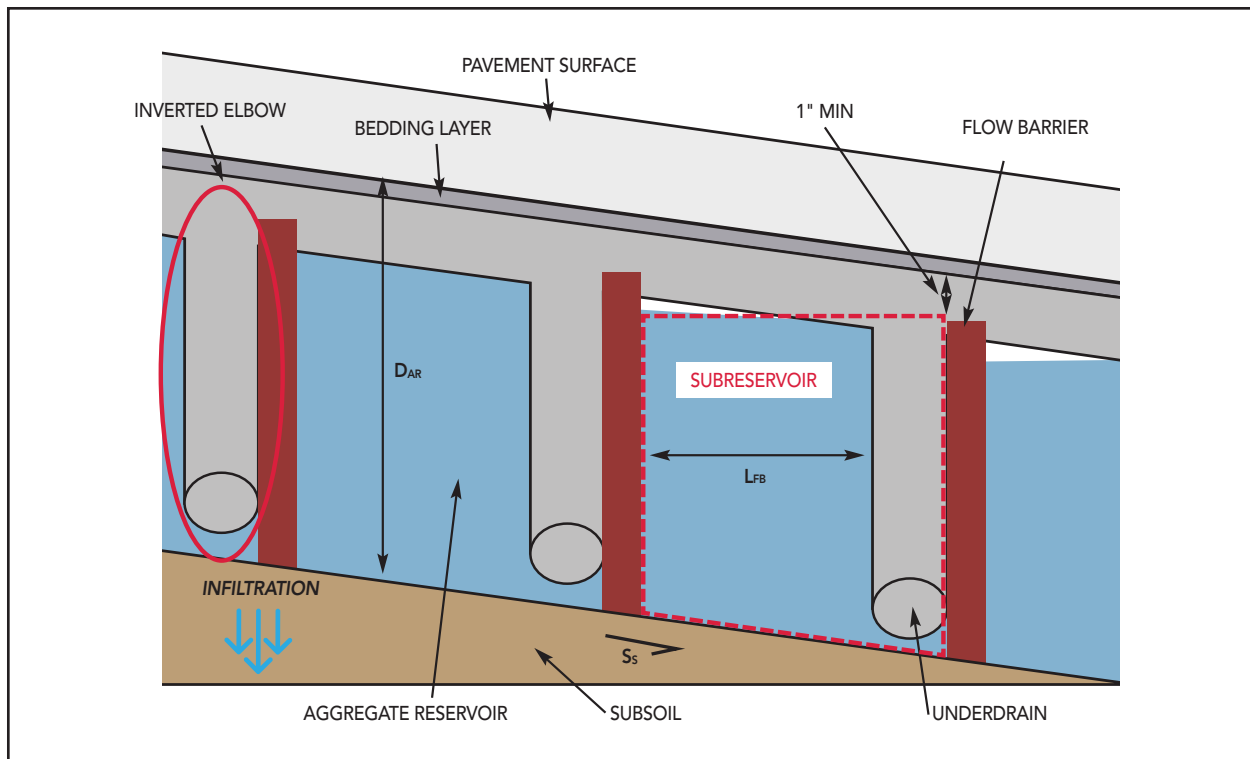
Profile View of a Sloped Permeable Pavement System
